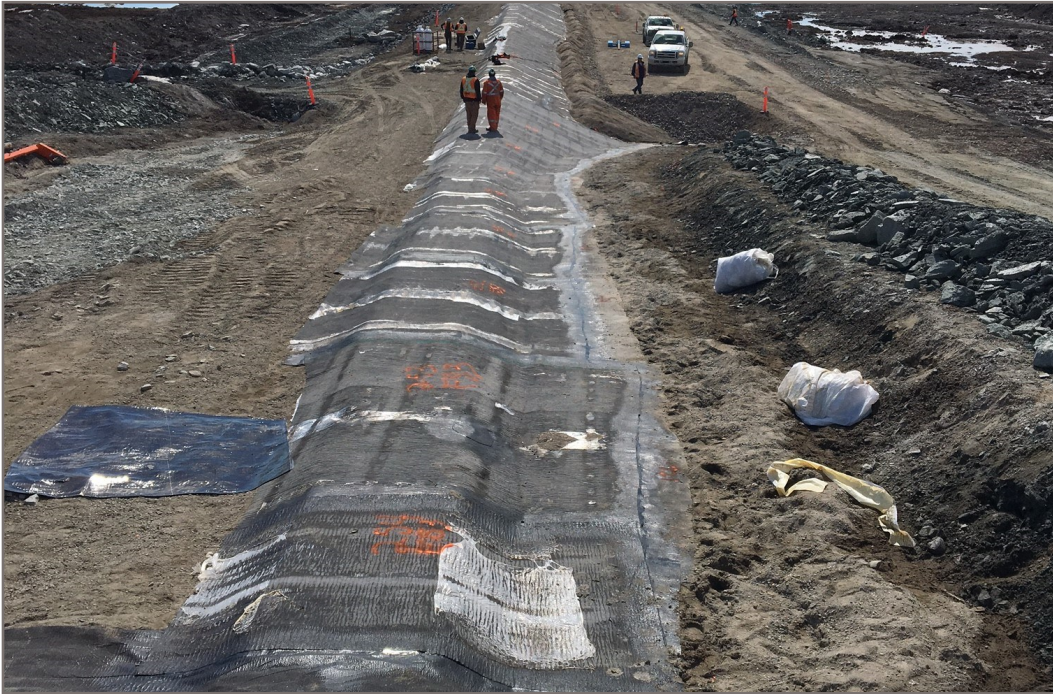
Phase 2 liner flipped back on downstream materials and welded to design elevation
